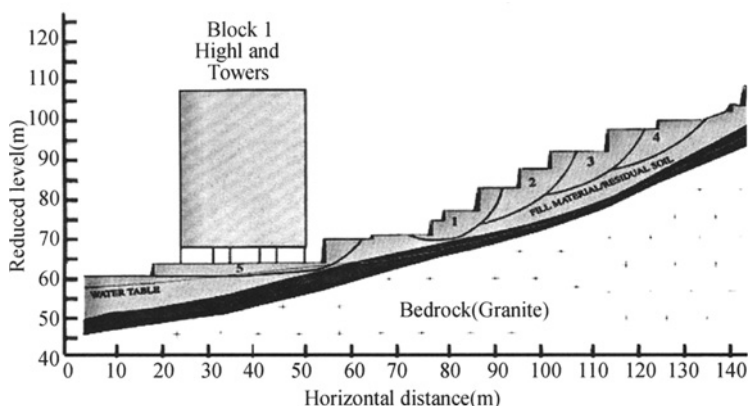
Retrogressive slope failure and sliding failure below building foundation
